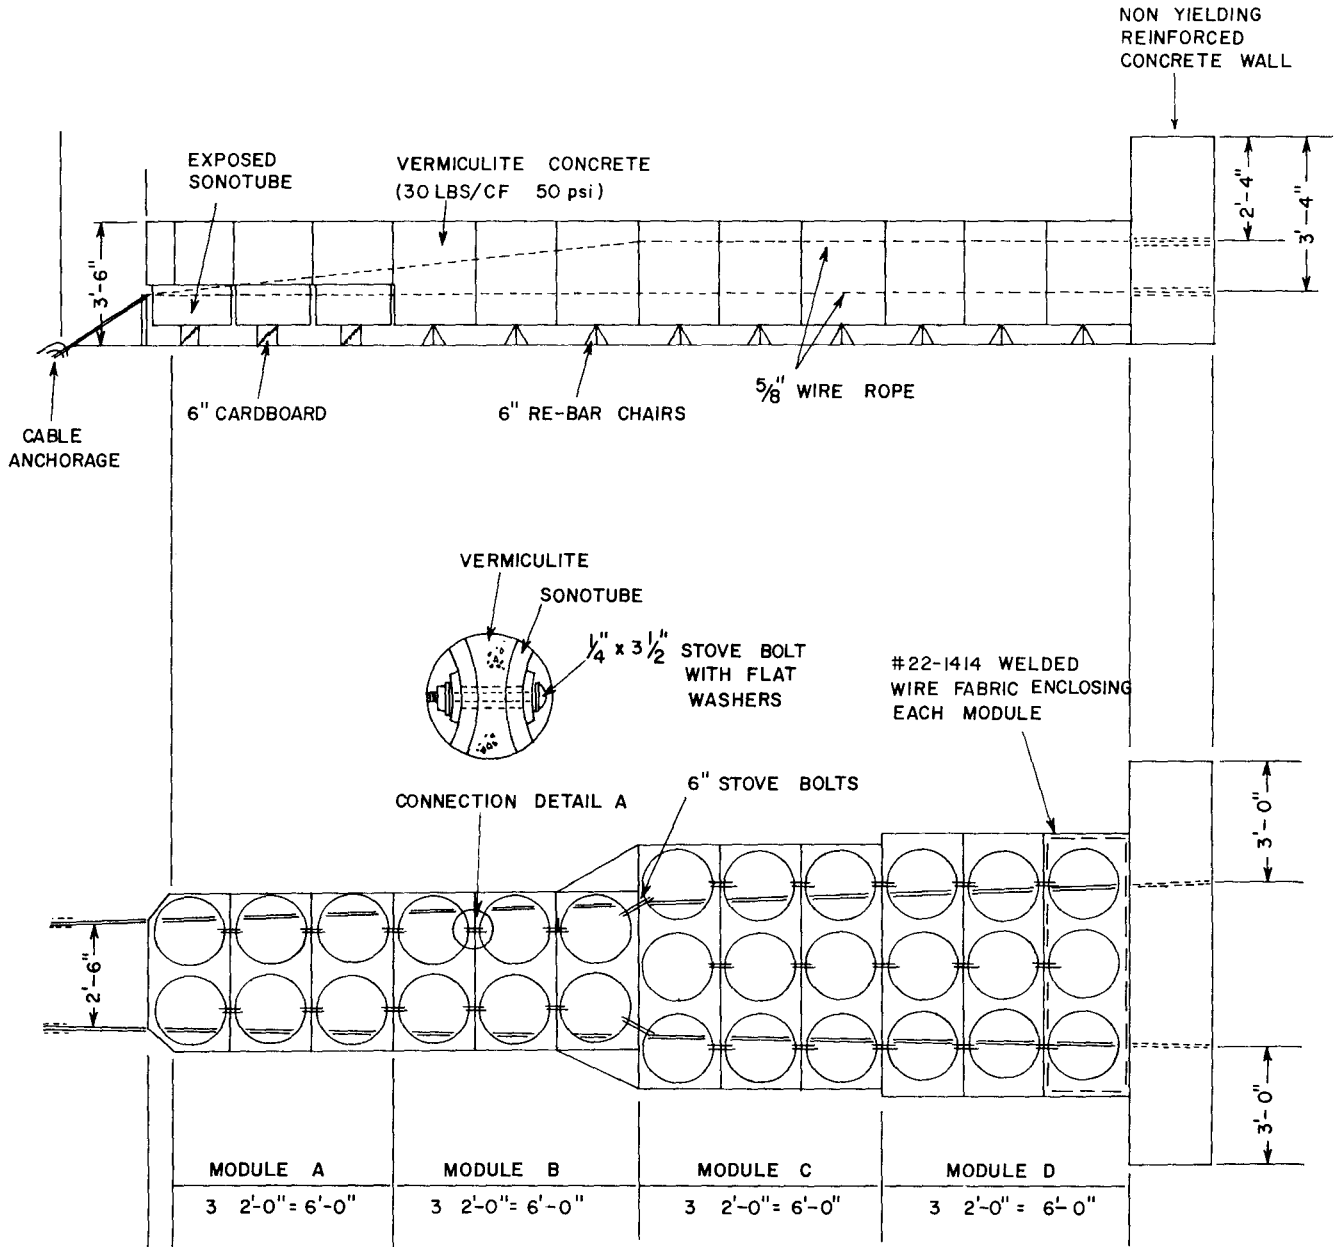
, CONCRETE CRASH CUSHION, TEST 505V-C
